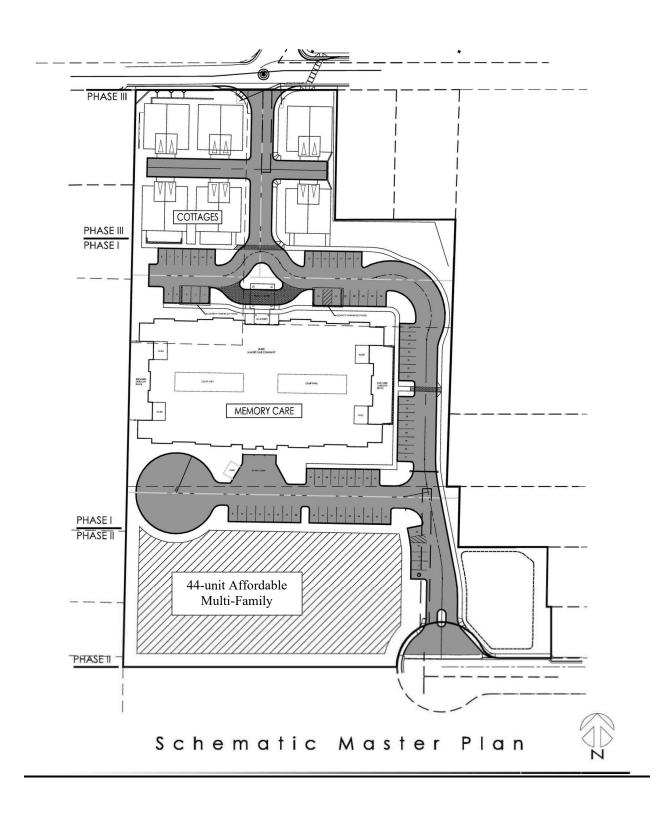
SIERRA SENIOR CARE SITE PLAN
